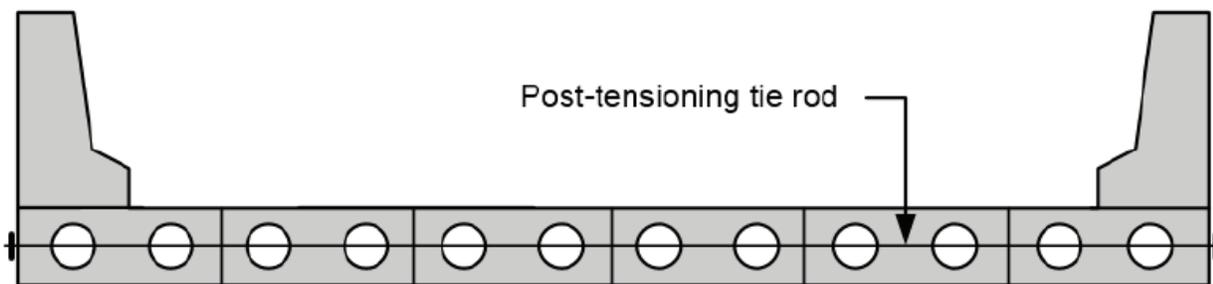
Cross Section - Precast Voided Slab Beam Bridge
